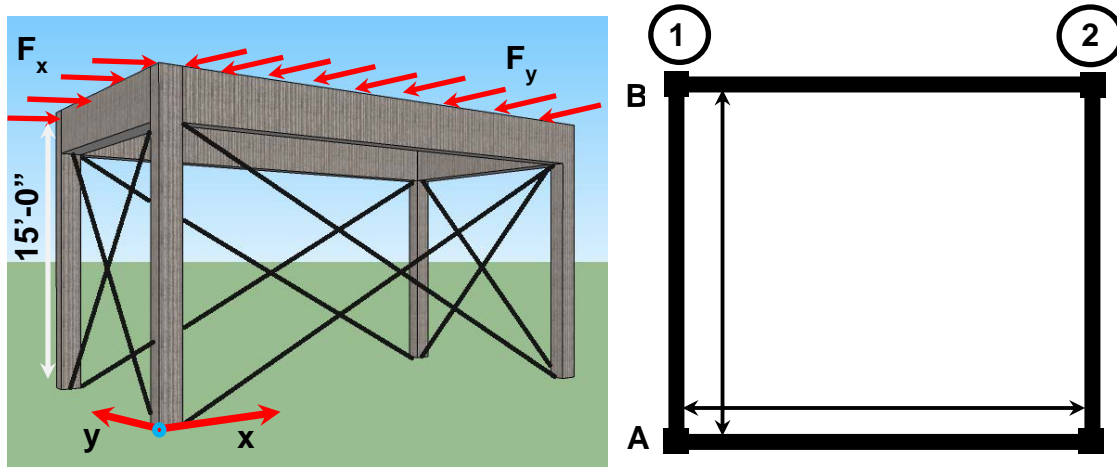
Basic prototype geometry and boundary conditions – left elevation, right plan view
